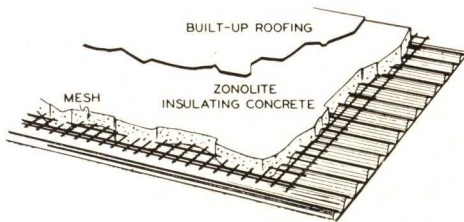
Zonolite Concrete over corrugated metal deck.
